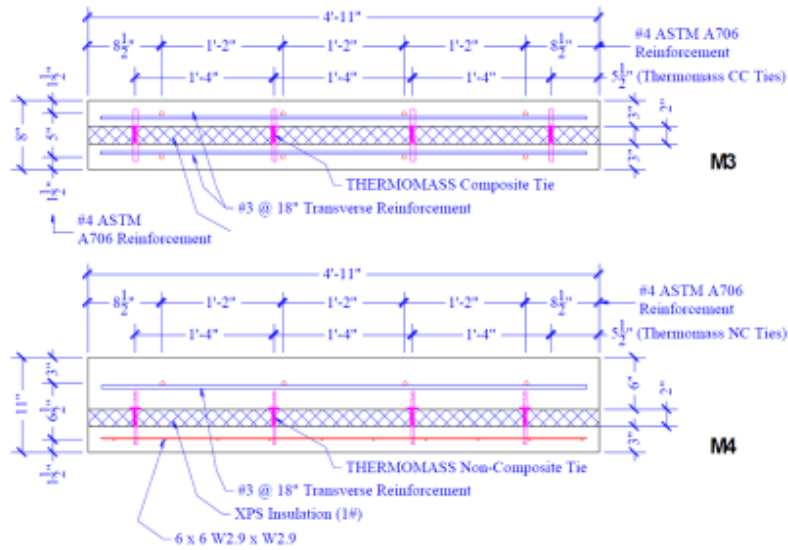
Single Span TCA Blast Specimens (Naito et al. 2011)
